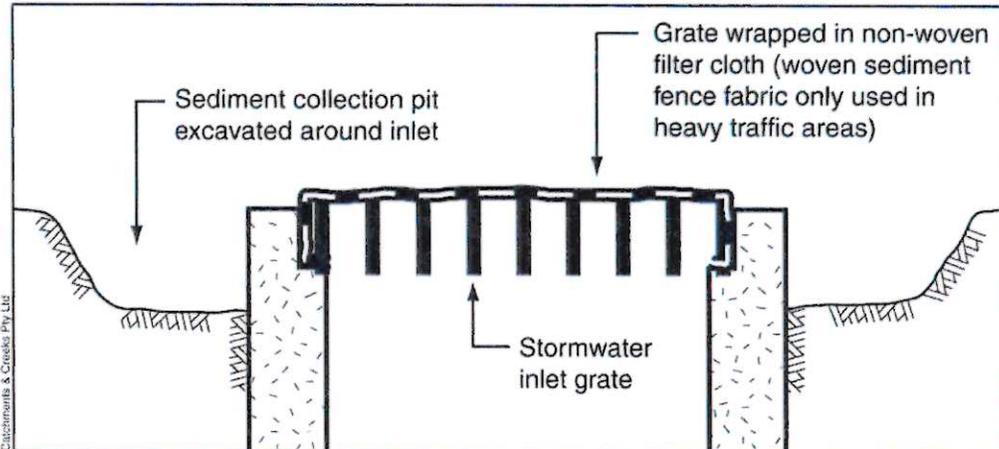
Fabric wrap drop inlet protection with optional sediment collection trench
